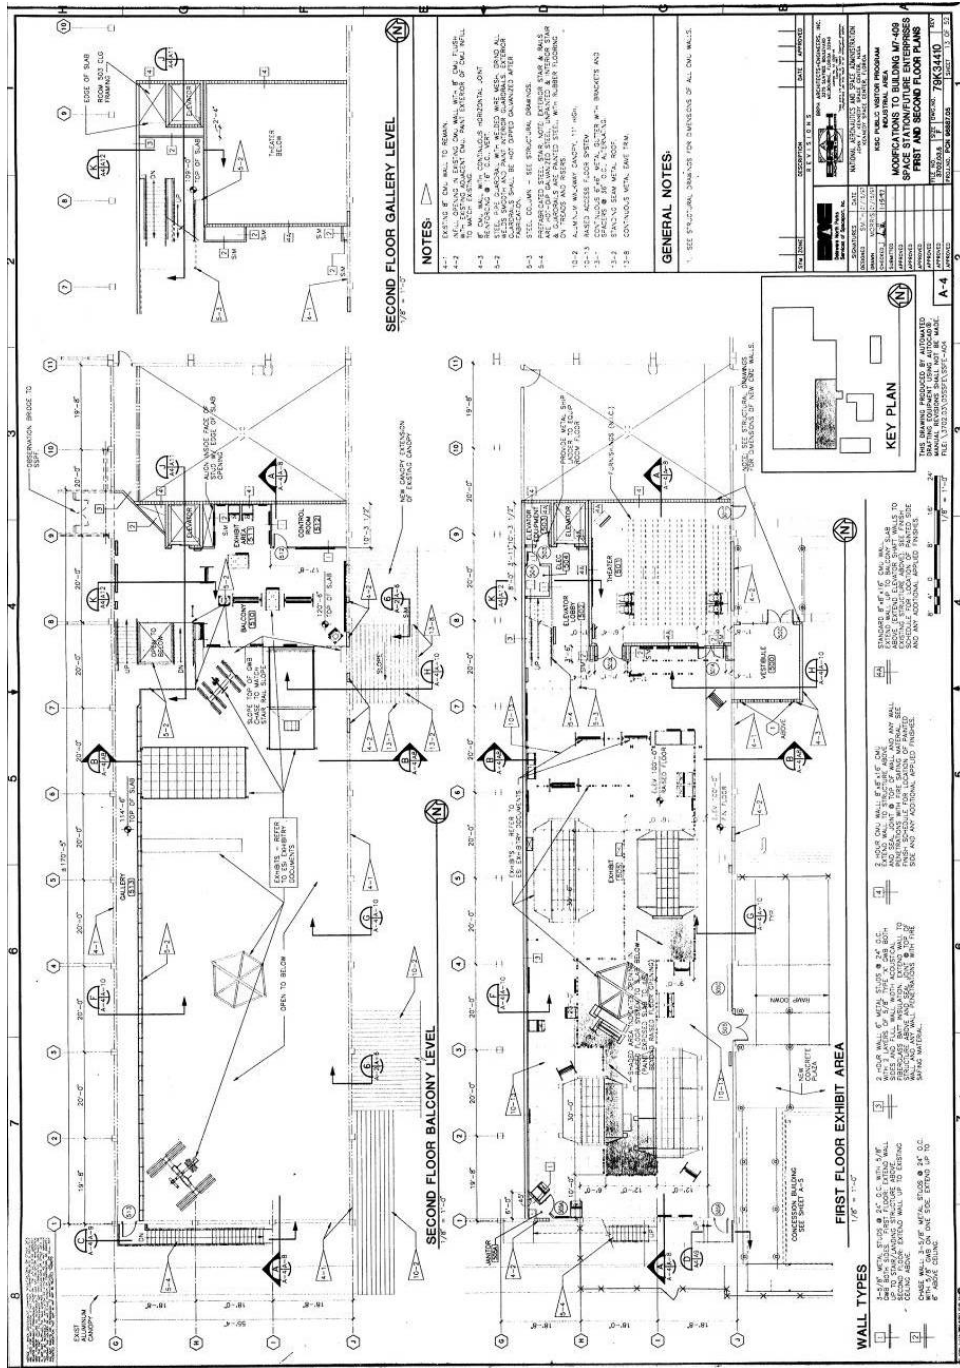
BRPH Architects & Engineers, Modifications to Building M7-409, First and Second Floor Plans, January 1997, Sheet 13 of 52.
